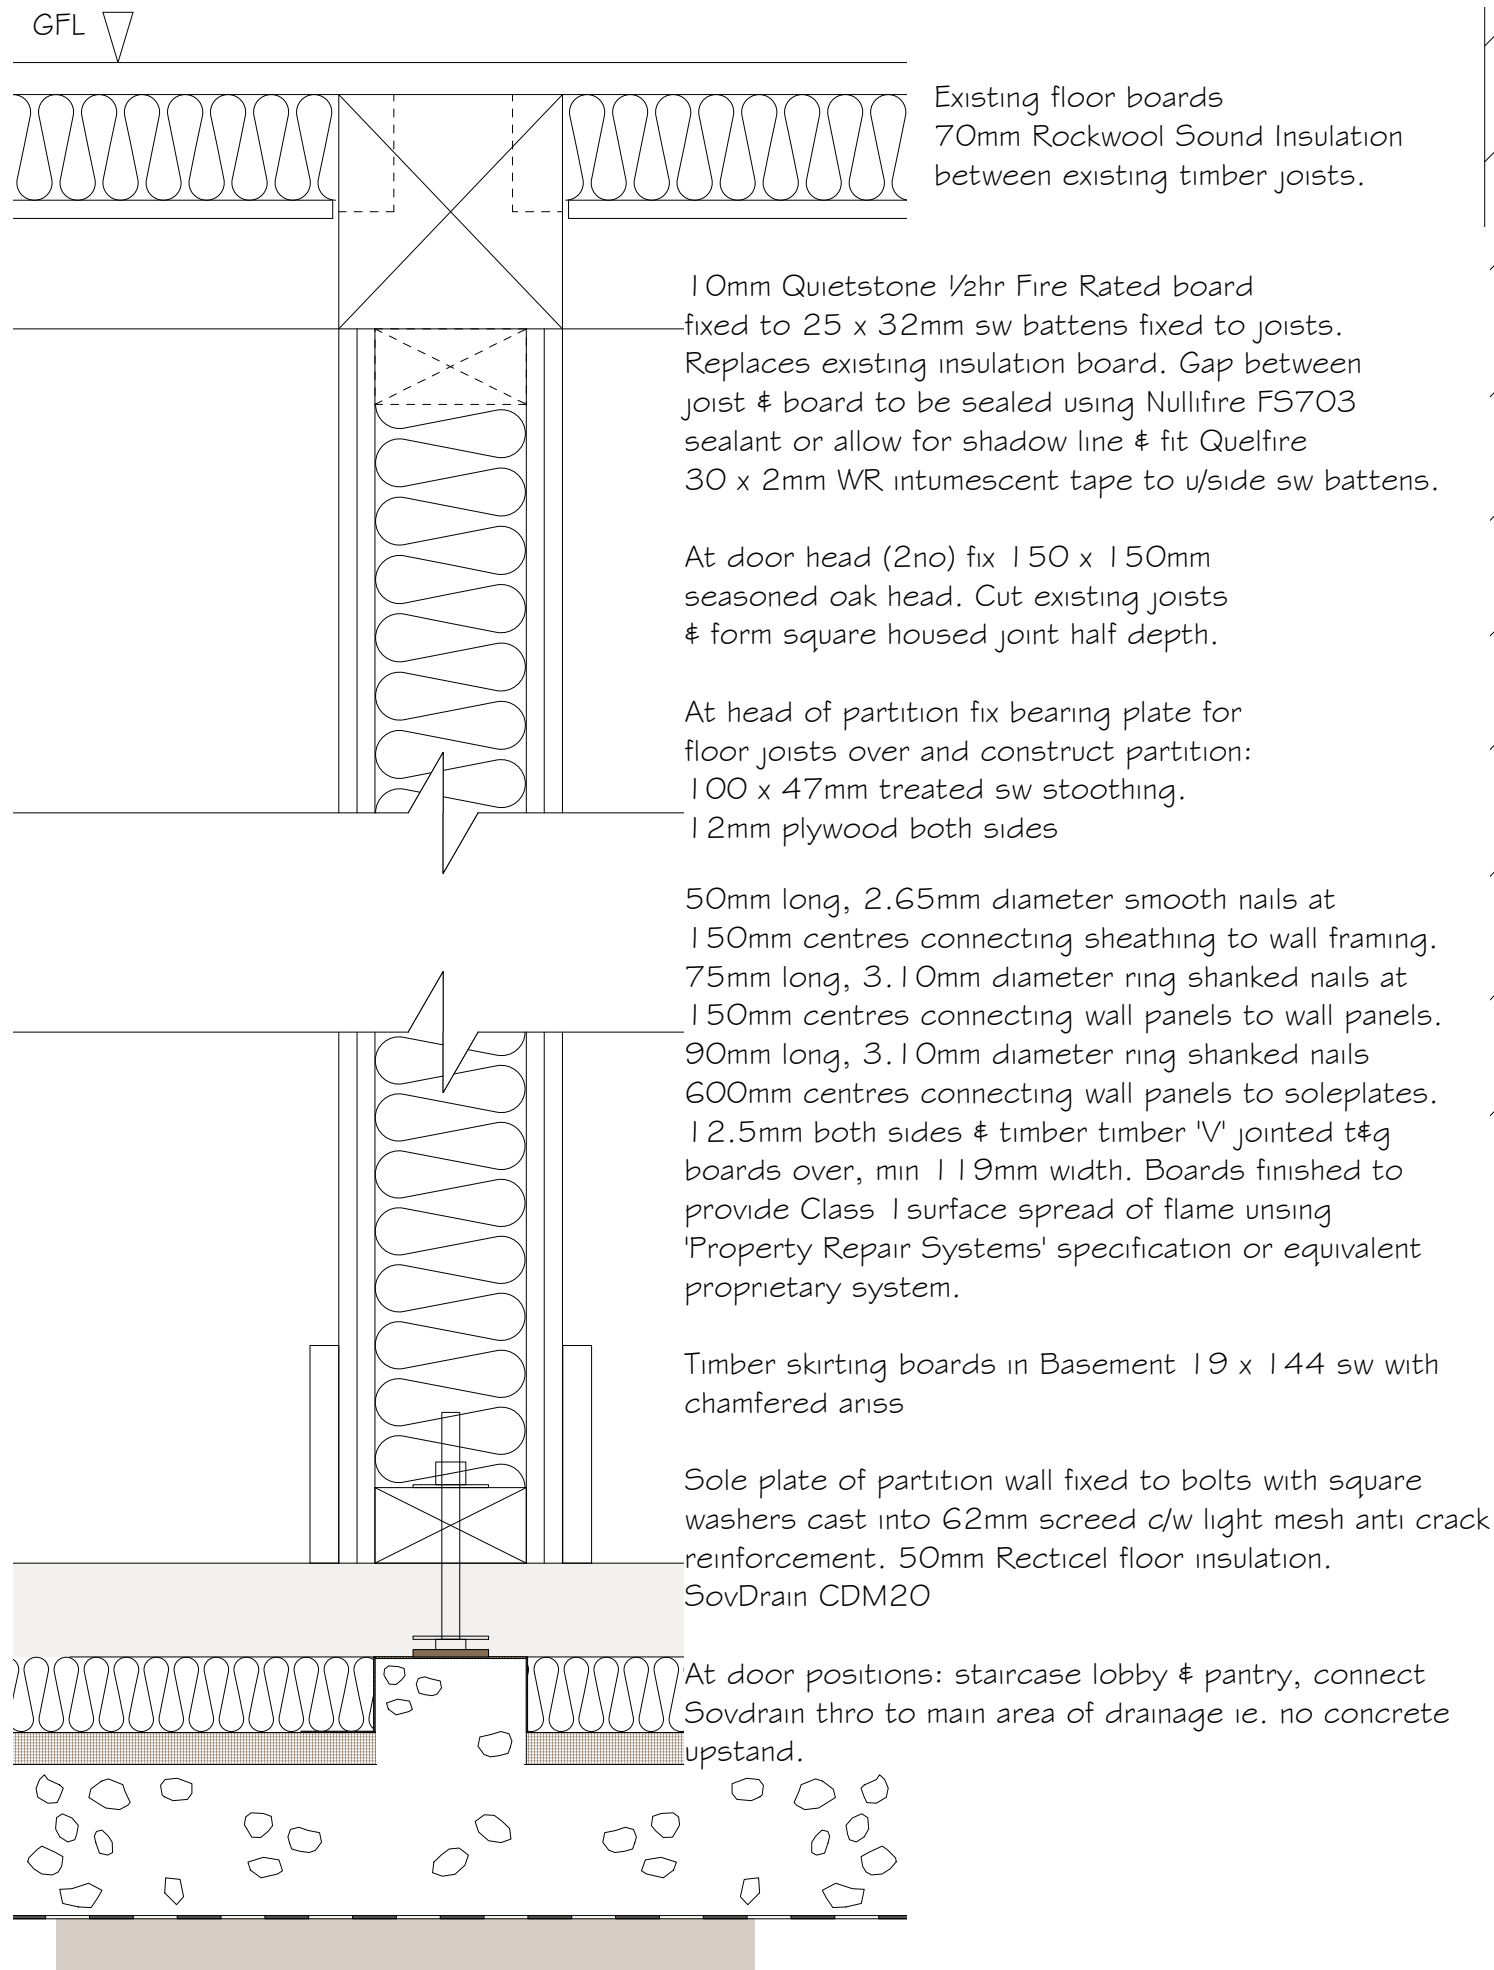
/11 Date: SEPTEMBER 2017 Scale: 1/50
